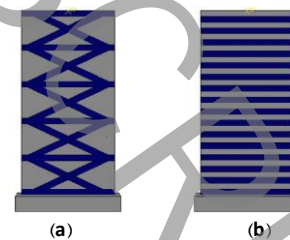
Reinforced shear wall model. a) With cross-shaped and horizontal sheets. b) With horizontally spiral arrangement of sheets.
